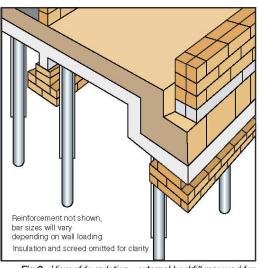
View of foundation - external backfill removed for clarity - use gravel or compressible material
